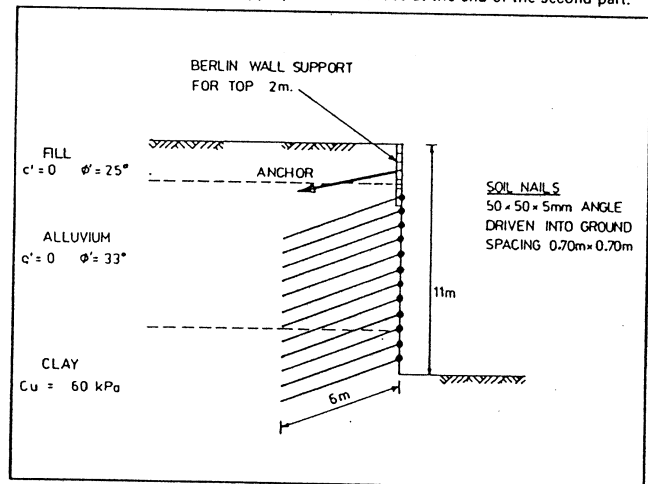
Cross-section of the Boulevard Victor, Paris excavation (After Medio et al, 1983)
